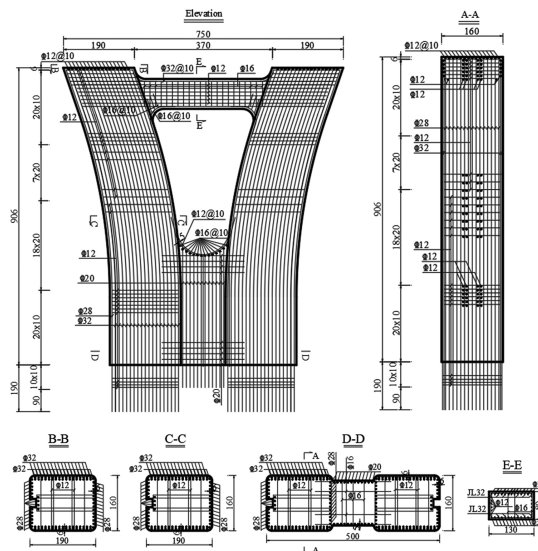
Rebar layout drawing of a Y-shaped bridge pier section (unit: cm)
